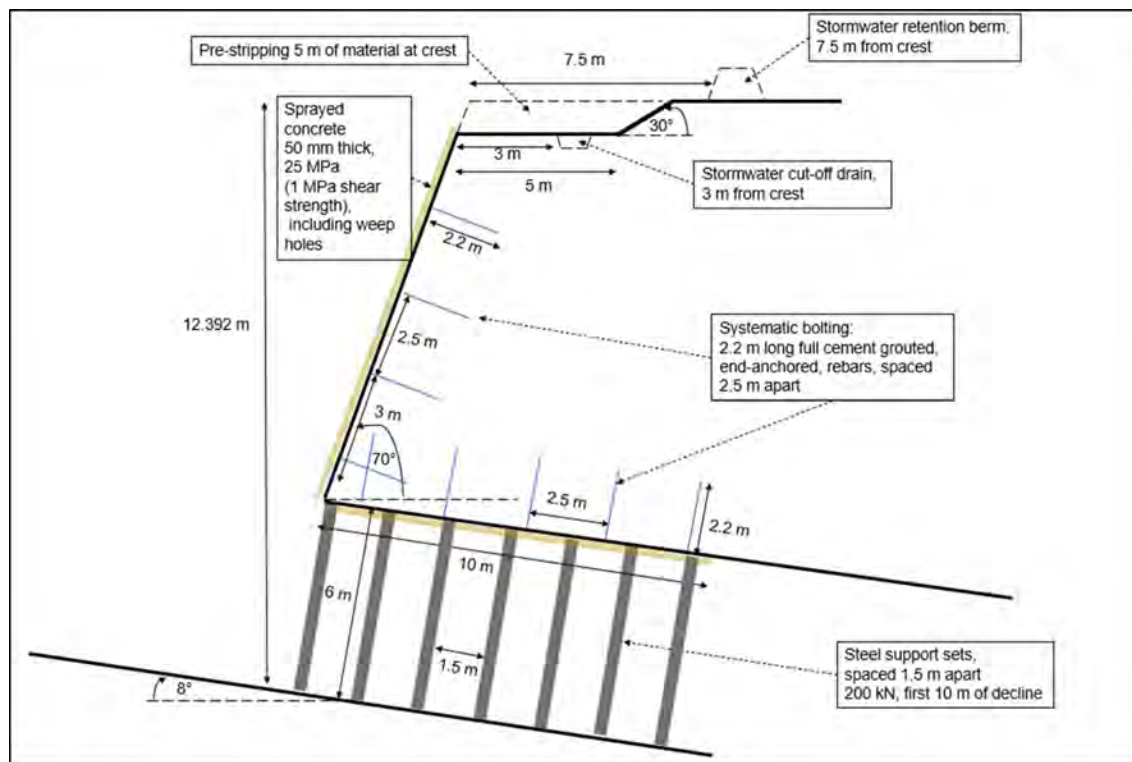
Section Through Boxcut Highwall Showing Highwall Support and Portal Area Support Requirements.
